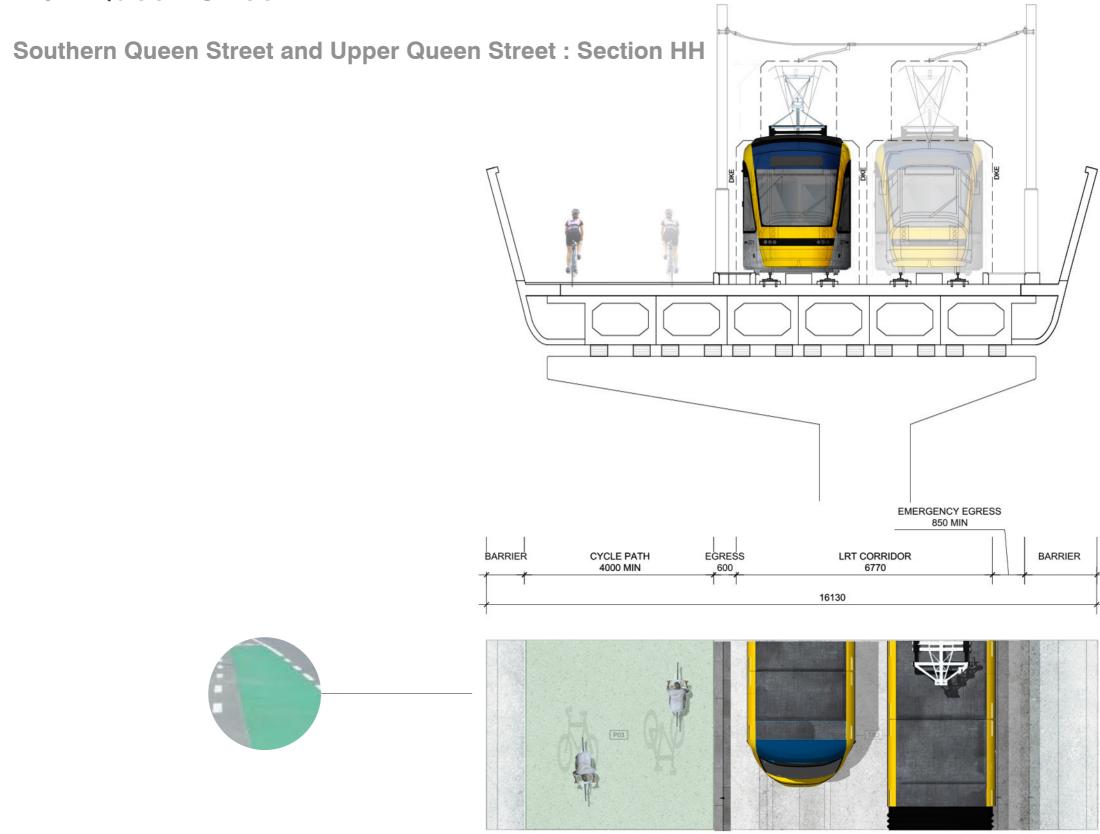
Partial Plan and cross section of the new LRT bridge over the CMJ. With a 4000mm wide cyclepath along the western edge.
